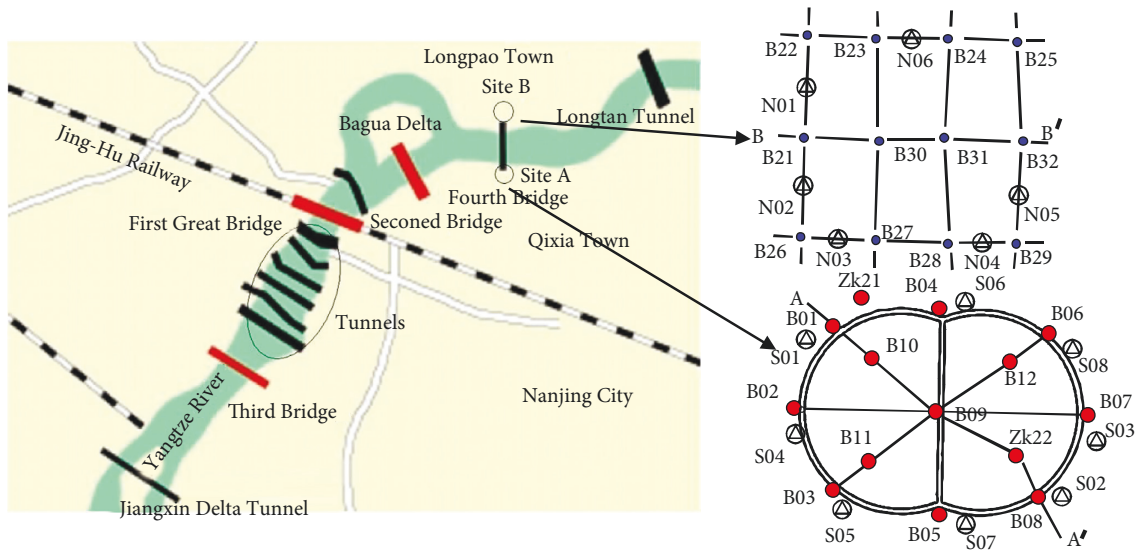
Layout of existing bridges and new alignments crossing the Yangtze River and location of the study area.
